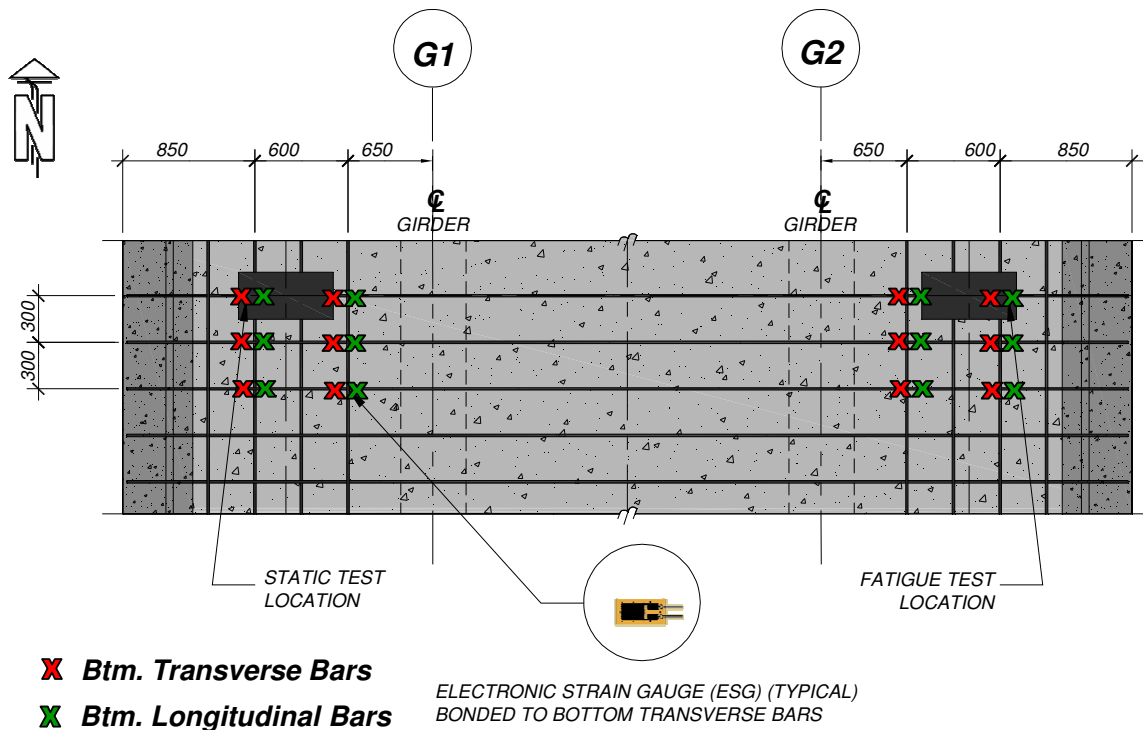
Schematic illustrating bottom transverse and longitudinal reinforcing bar strain gauge locations for the cantilever section with steel reinforcement
